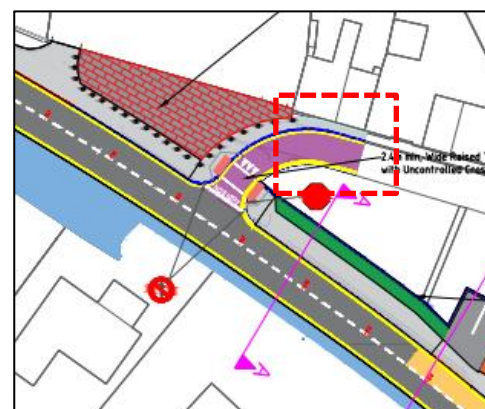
Proposed Realignment with parking restrictions (Dwg No. 11199-3-005)
